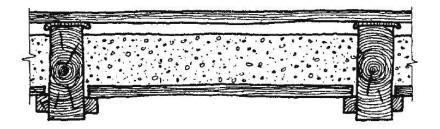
Mineral LWL is used between floor joists (Minke 2006).
